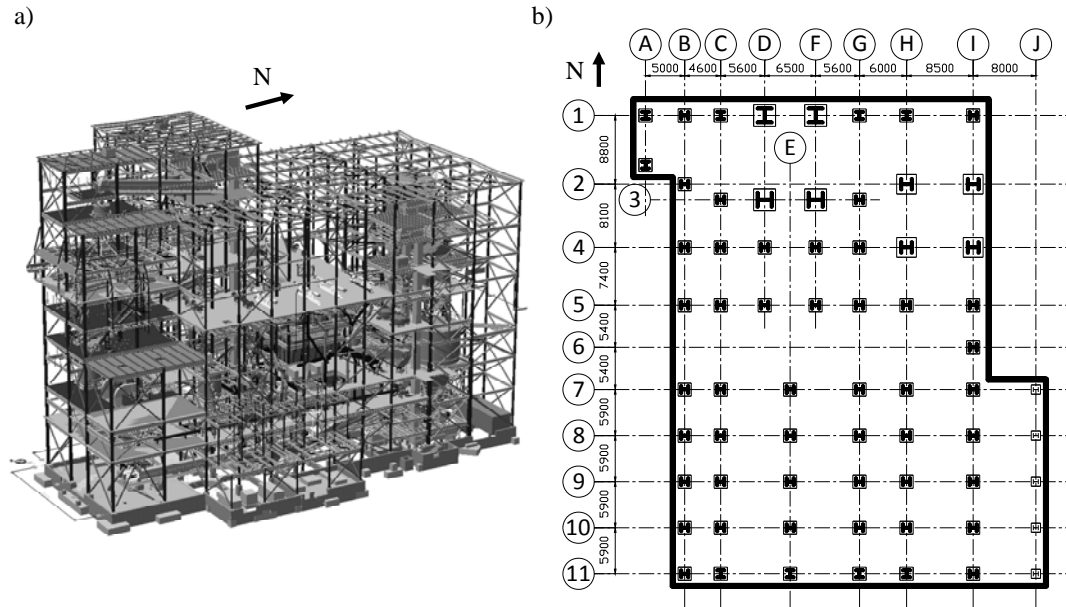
Irregular building studied: a) Three-dimensional view; b) Column layout at the base.
